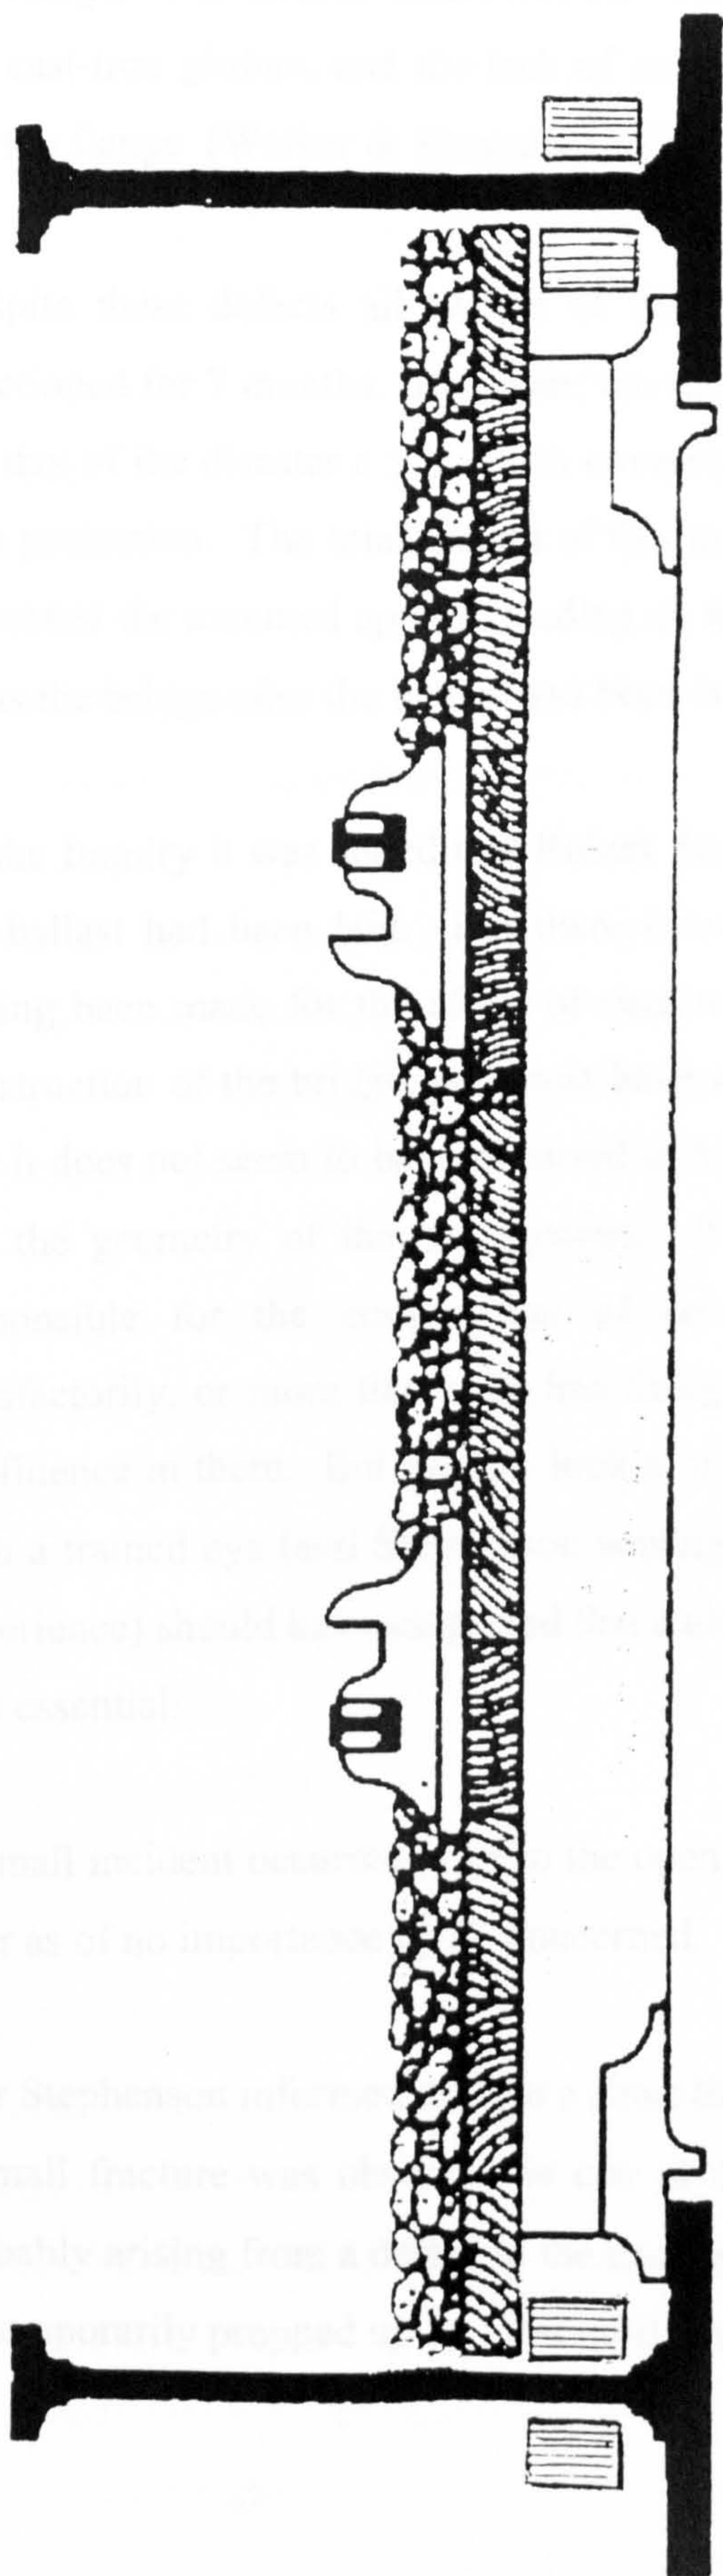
Eccentric bearing of deck on top of girder flange at centre of girder,
